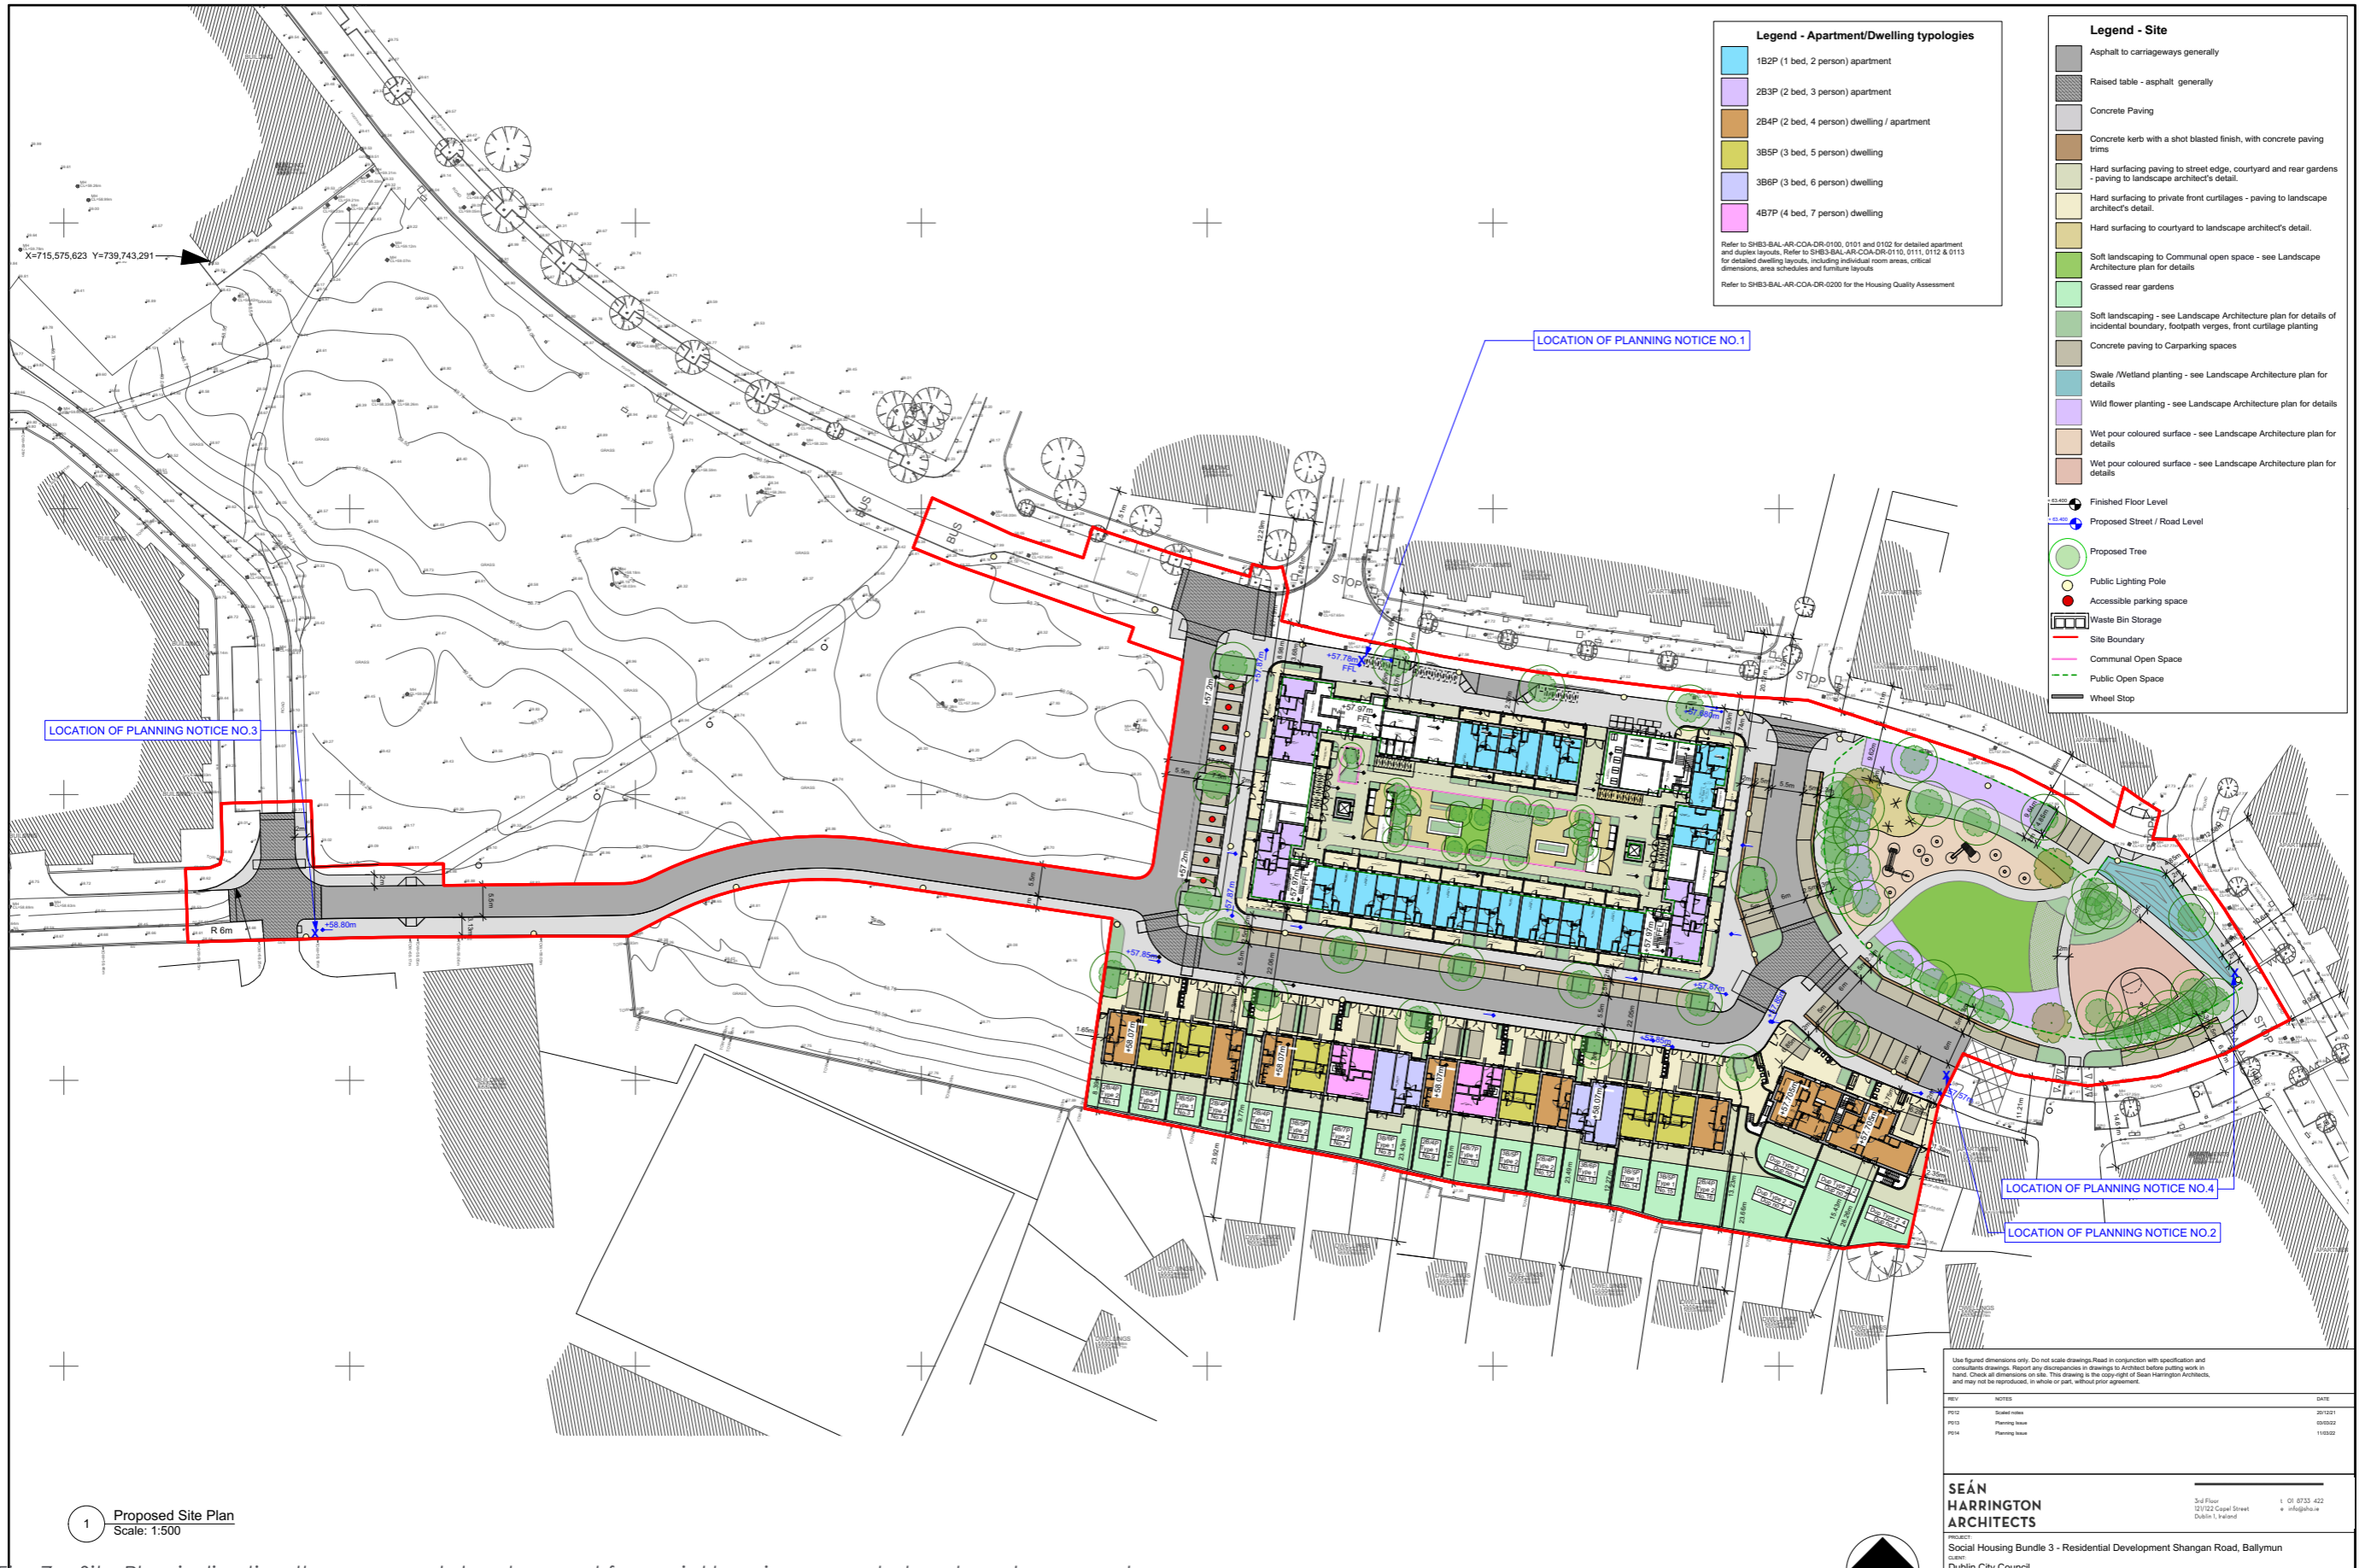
Site Plan indicating the proposed development for social housing, a pocket park and new road as part Development Site 10 (Planning Reference: 3926/22)
